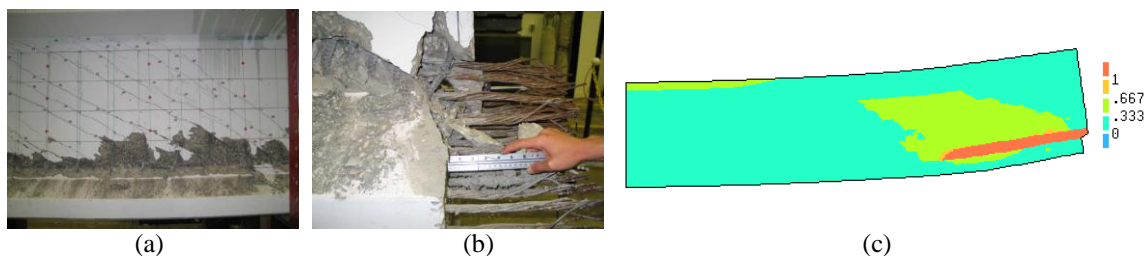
Typical web crushing failure observed in the girders G1E, G1W, G2E and G2W: (a) East half of girder G2 at failure [95]; (b) Detail of the end region [95]; (c) F-CMM analysis of the half girder G2E - deformed shape (x10) with the E_{max} contour levels in the post-peak stage.
